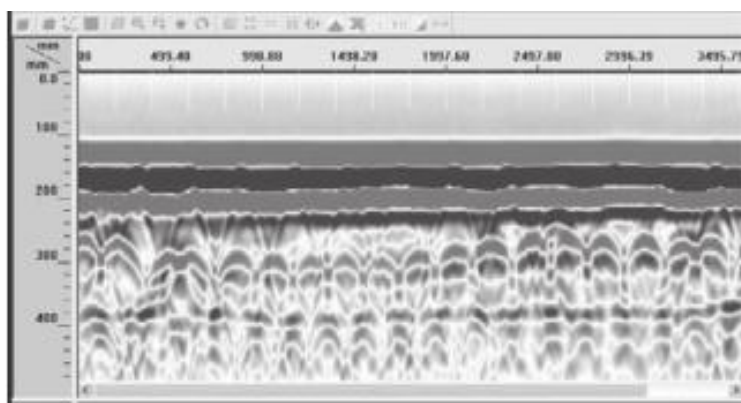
Transverse reinforcement of the bridge pier (1.5 GHz antenna)
